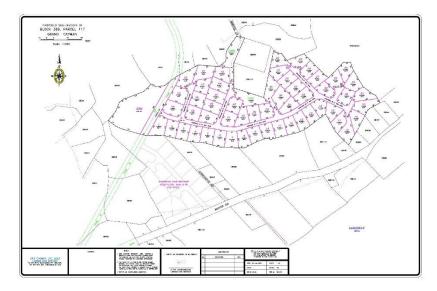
Proposed subdivision layout (Source: Planning Submission Set, 2023)
